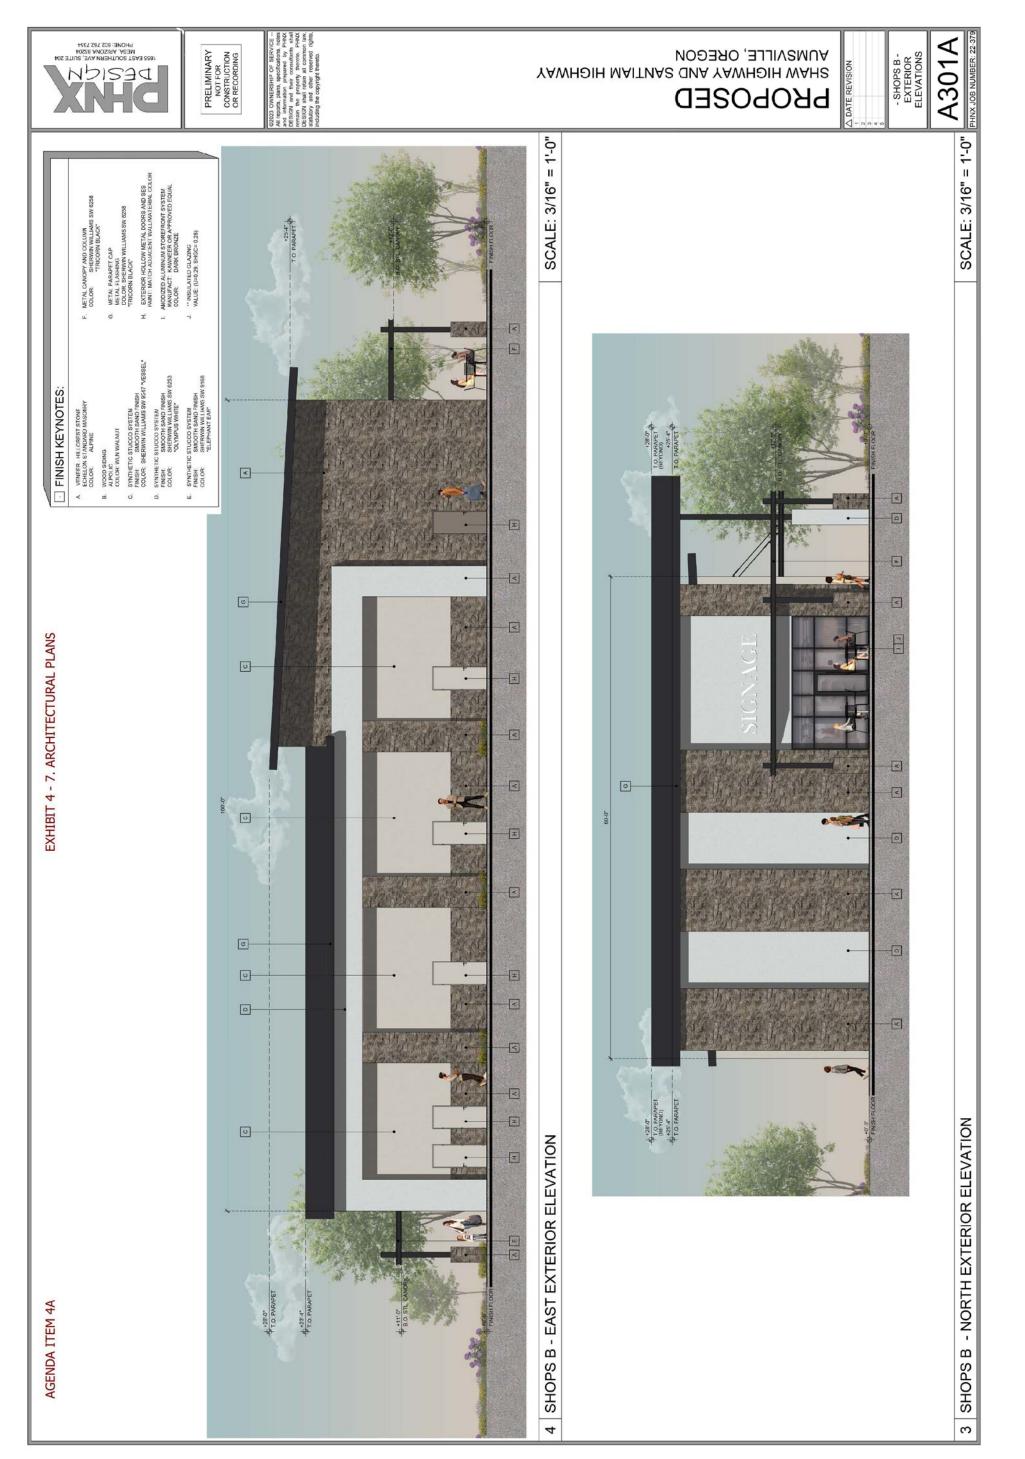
7. ARCHITECTURAL PLANS
